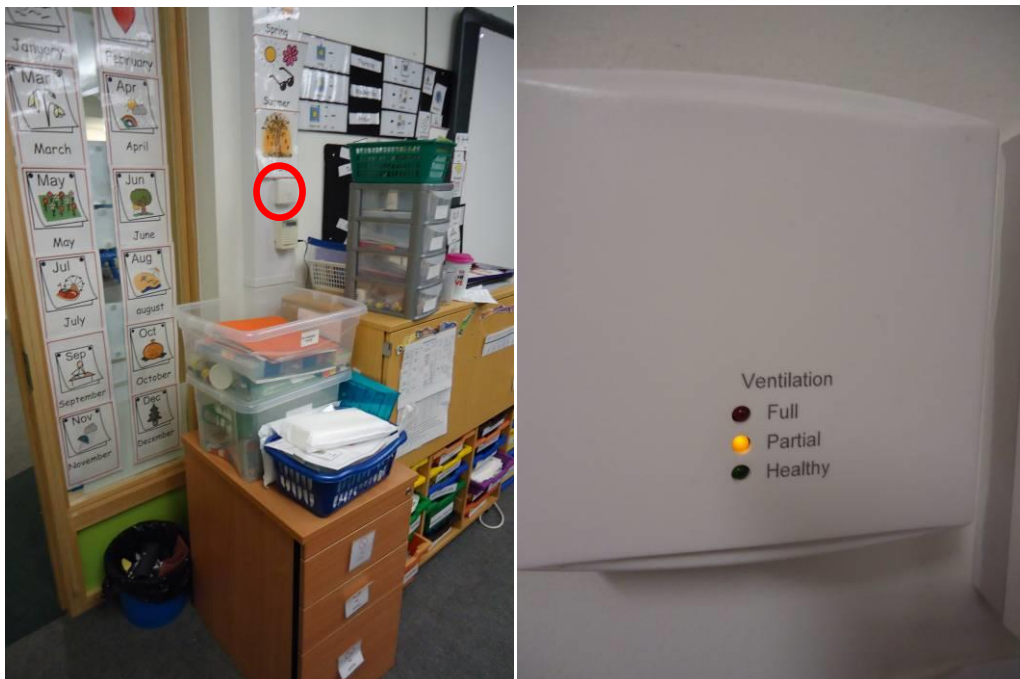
CO₂ sensor on wall in room C130 Cann Bridge block highlighted in red and close up. Note that its design does not make it stand out on crowded wall.
